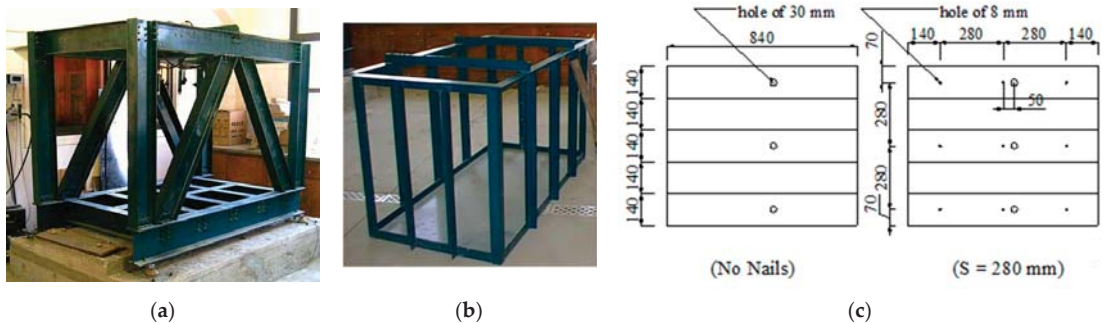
Testing loading frame, sand tank and slope facing panels; (a) loading frame; (b) sand tank; (c) slope facing panels.
